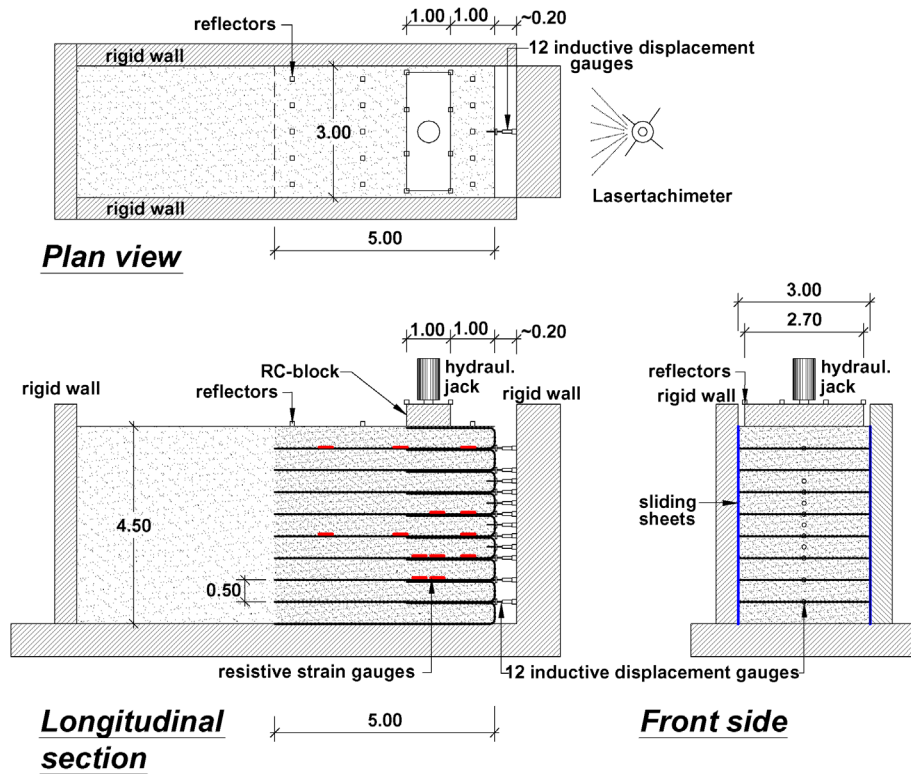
Test set-up and instrumentation of a full scale geogrid reinforced bridge abutment loading test (Alexiew [1])
